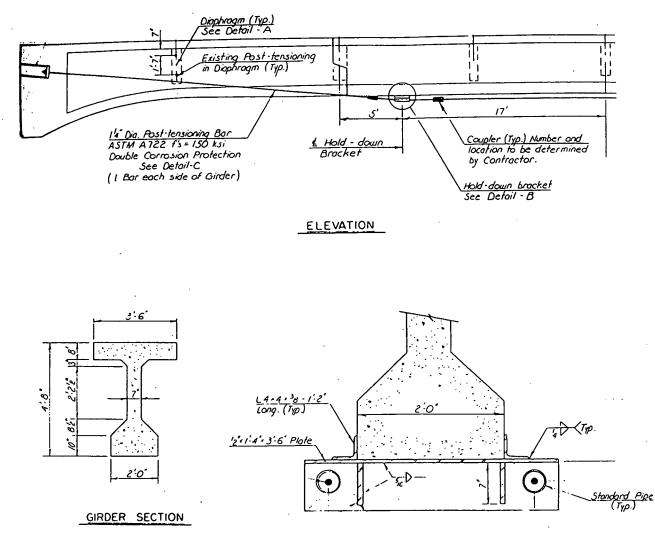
Post-tensioning of precast concrete beam (Connecticut DOT).
